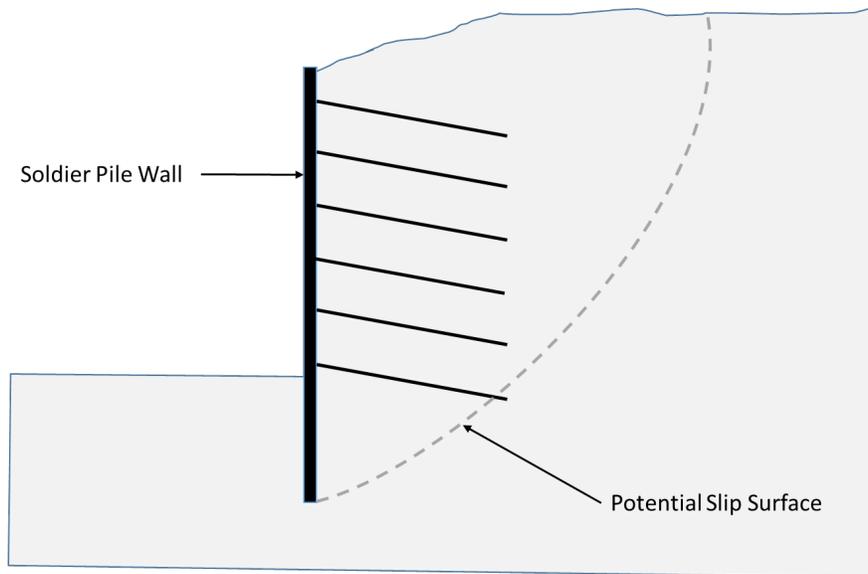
Potential slip surface for a soldier pile wall.
